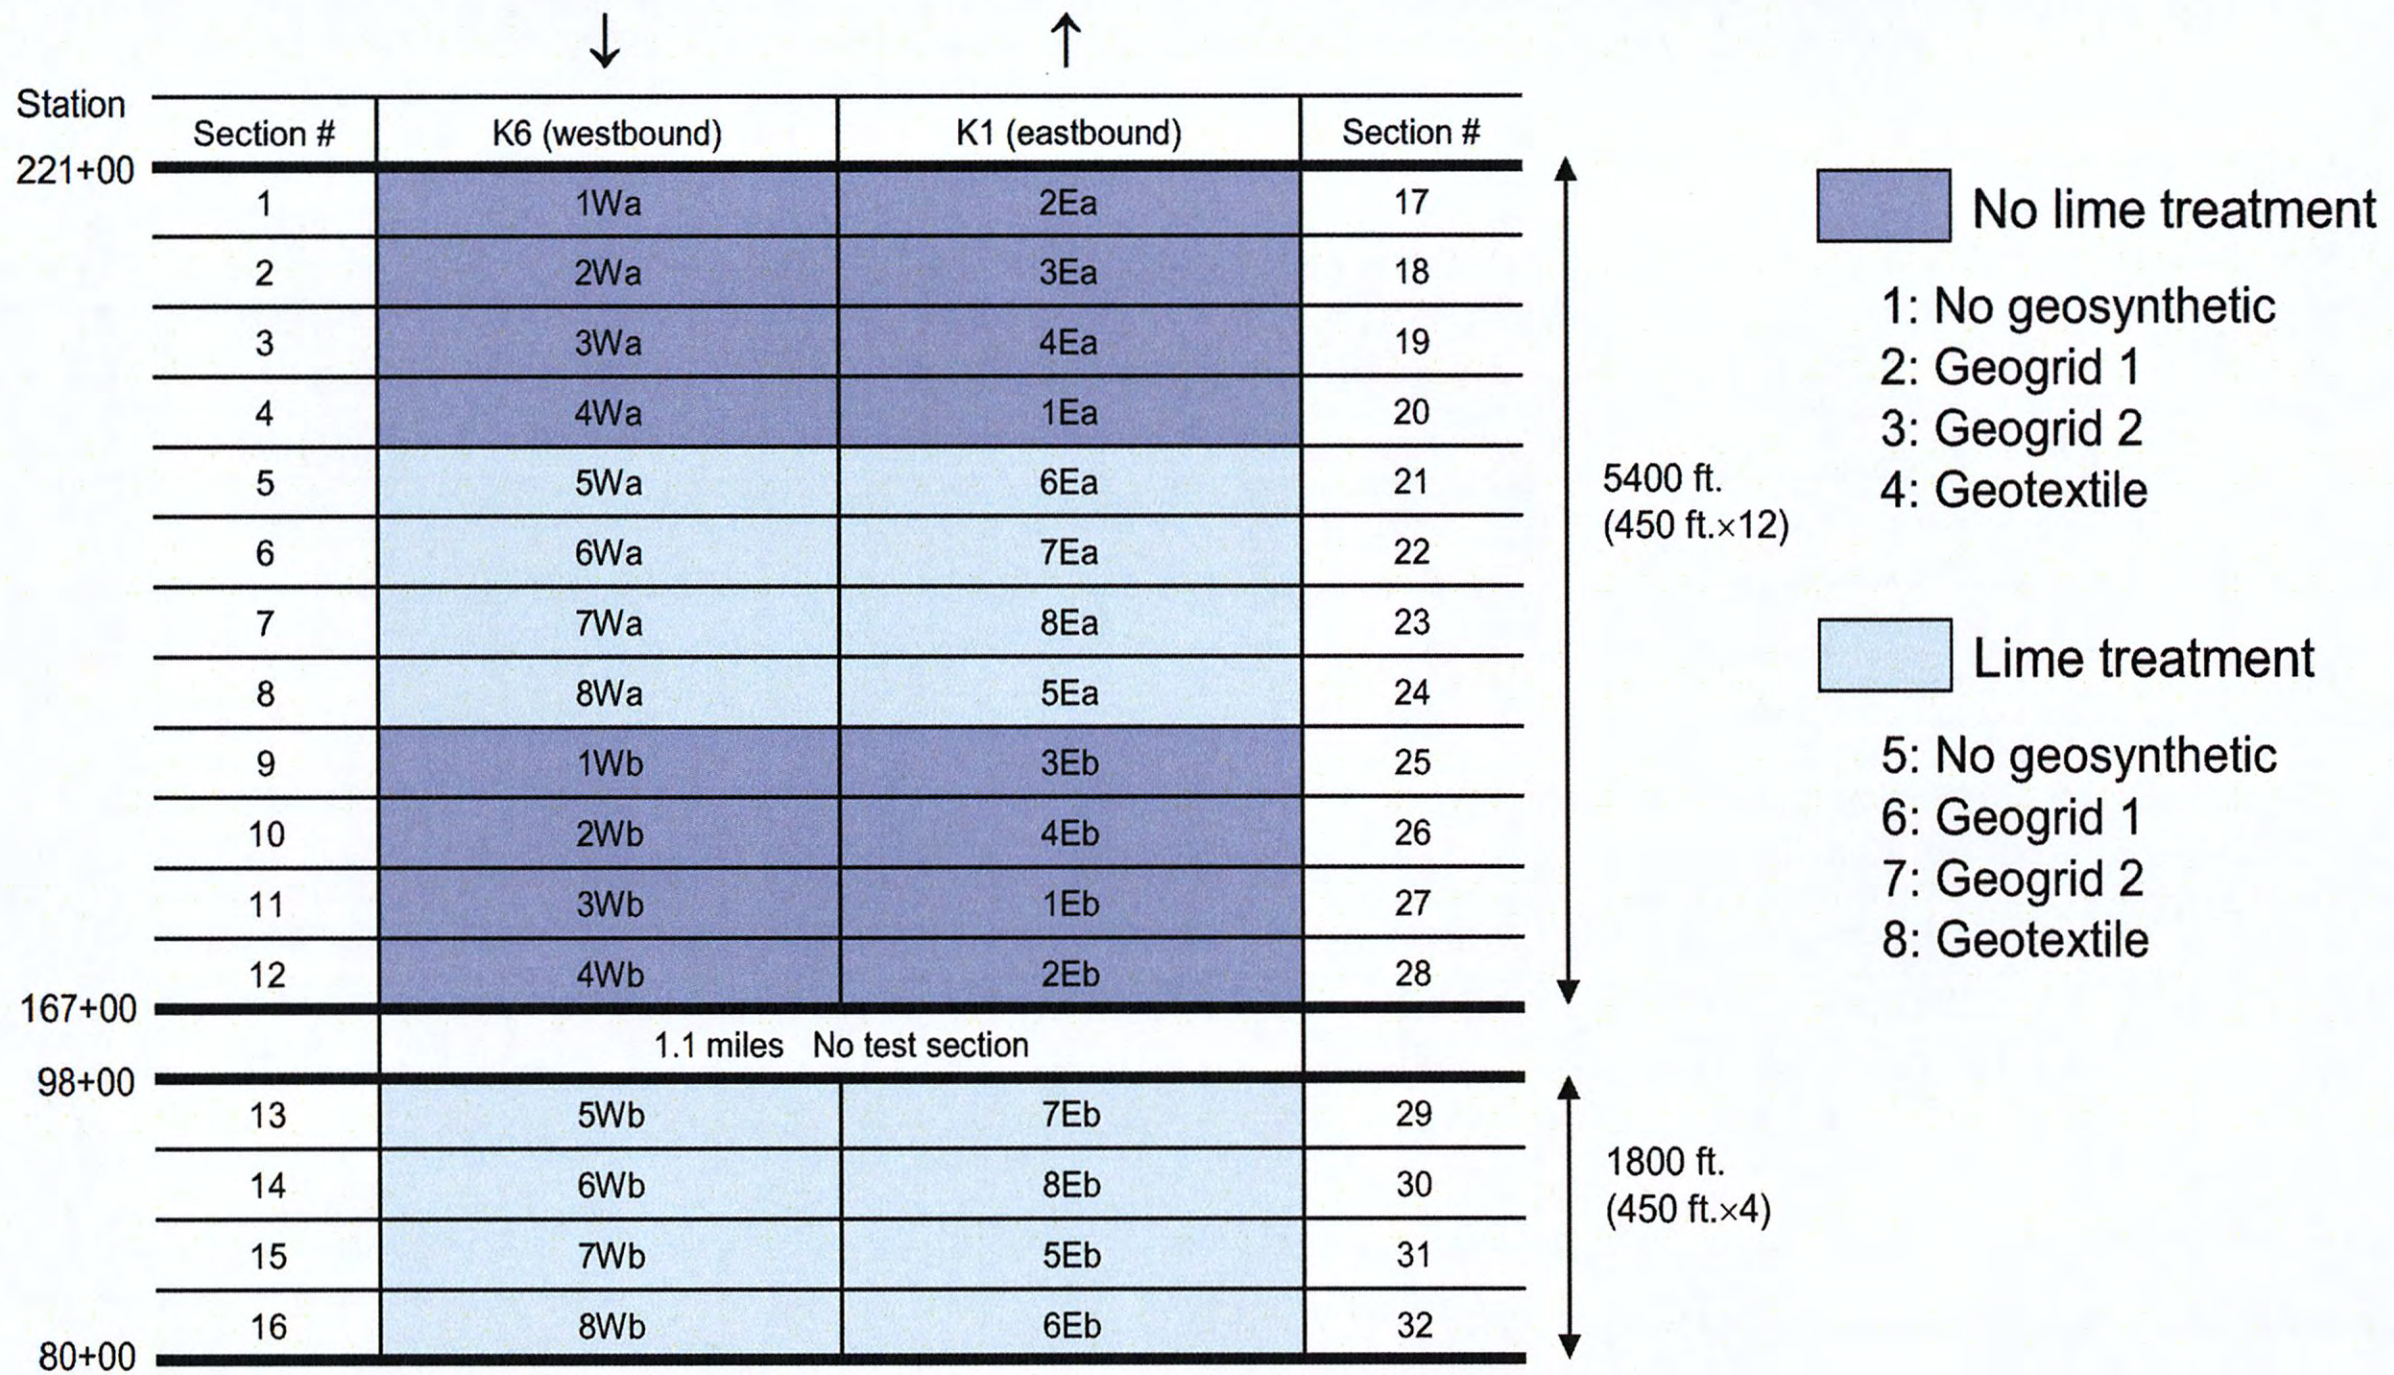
FM 2 Reconstruction Layout (after Zornberg et al., 2008).
